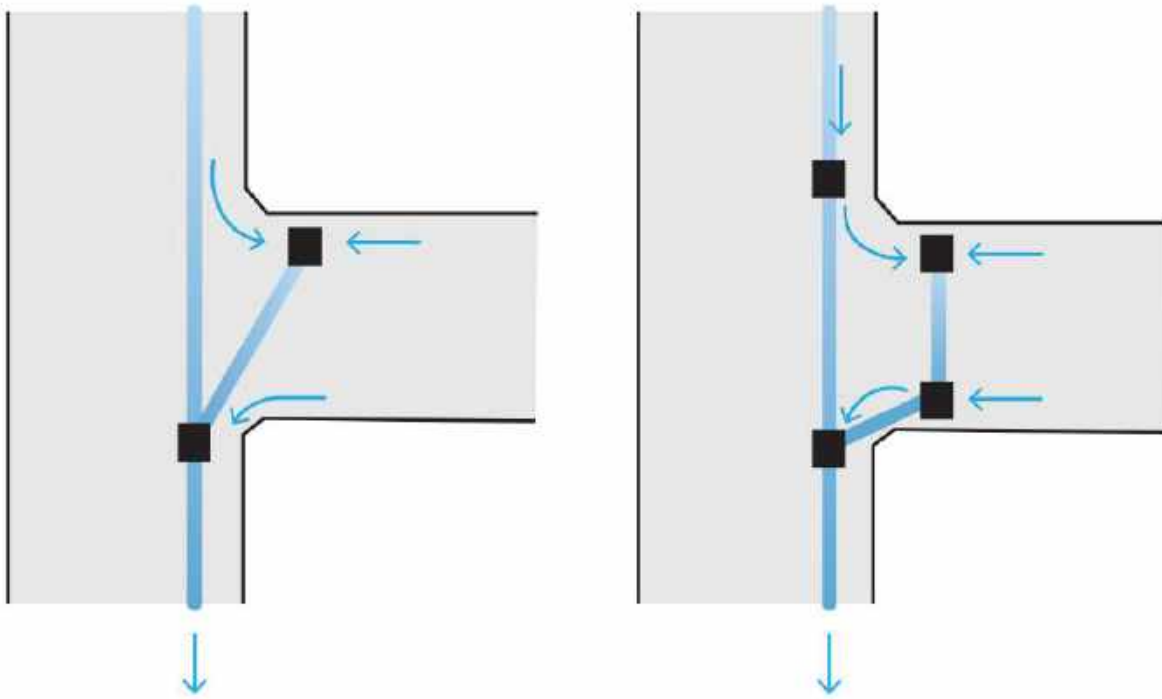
Example of Alternative Configurations of Inlet Pits at a Road Intersection
